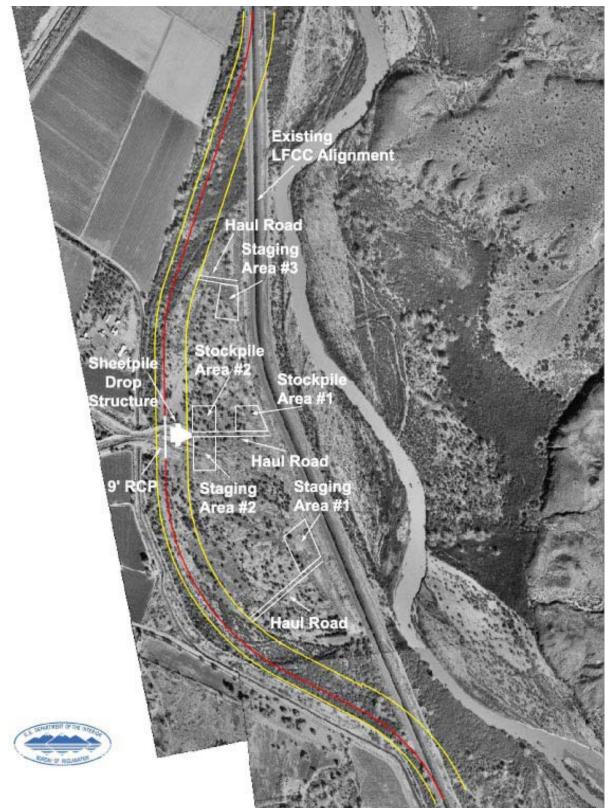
Aerial view showing the locations of the proposed new LFCC alignment, haul roads, staging, and stockpiling areas, sheetpile drop structure and the RCP.
